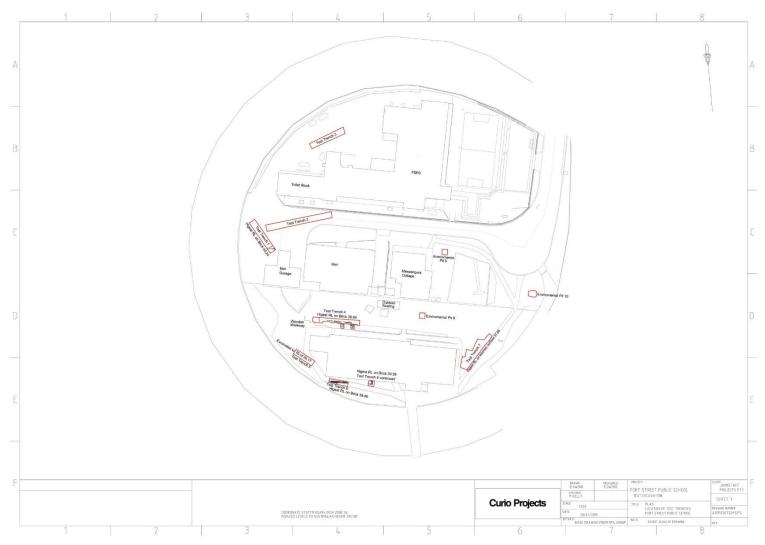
Location of test trenches at Fort Street Public School (Source: Curio, 2019)
